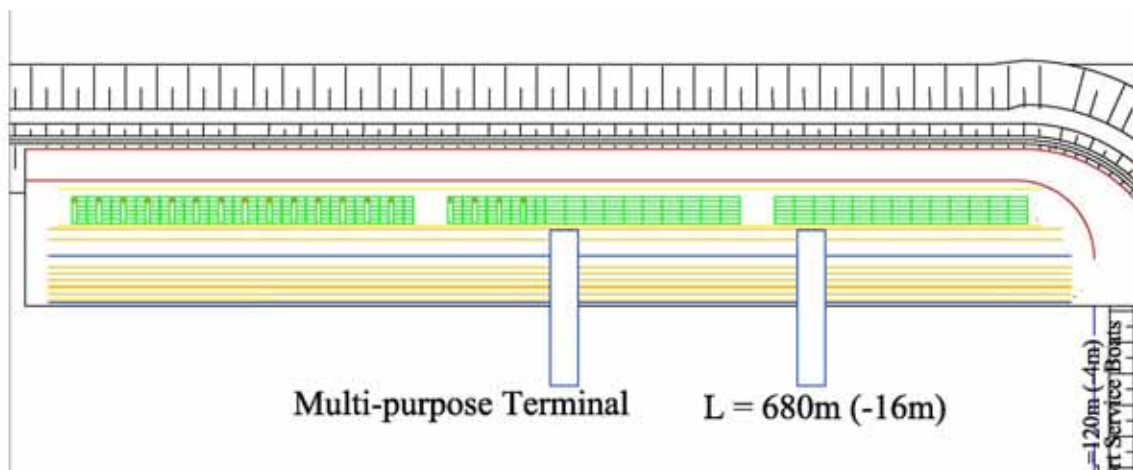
Facility Layout Plan of Pier 3 for Container-handling
